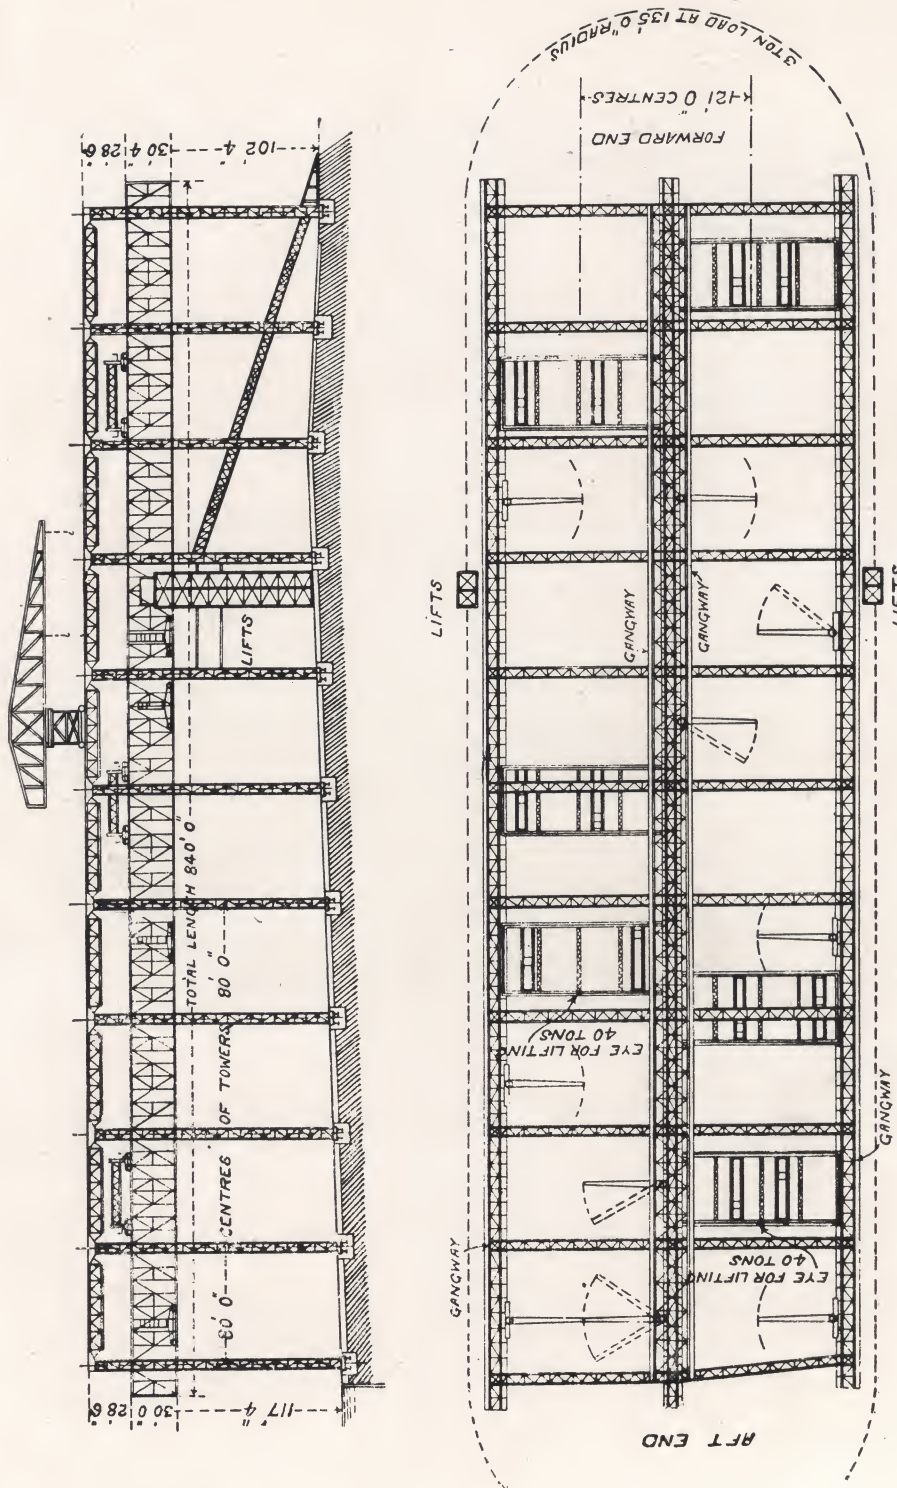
Elevation and Plan of Gantry over Slips Nos. 2 and 3.
